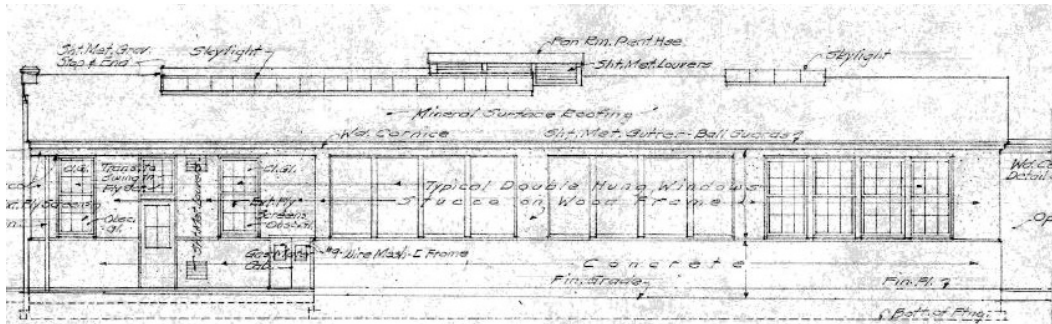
East façade of Cafeteria building as designed in 1949. Source: OUSD.
